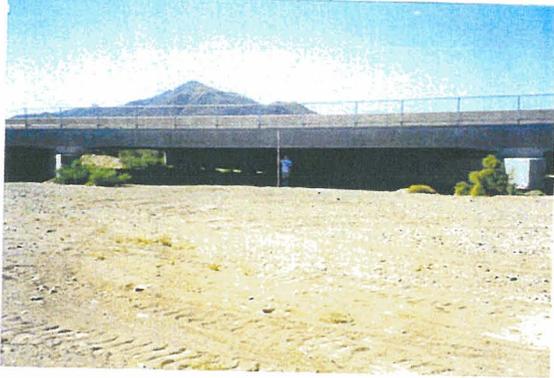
New River Road Bridge over Skunk Creek. Site of recent aggradation.
